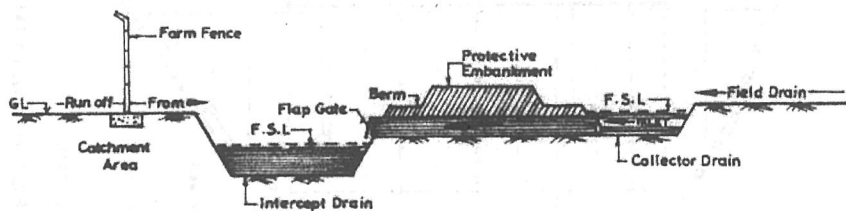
PROPOSED DRAINS AND PROTECTIVE EMBANKMENT FOR FARMS (NTS)
